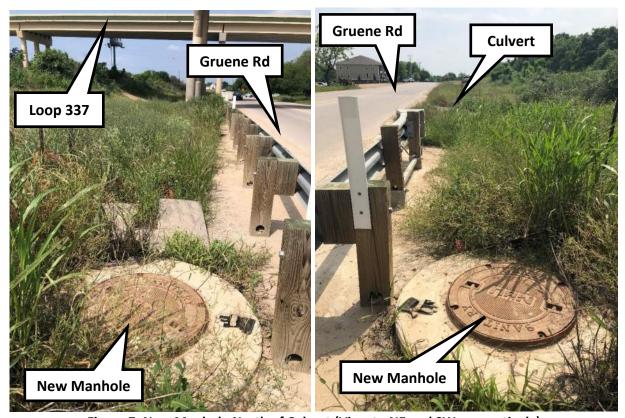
New Manhole North of Culvert (View to NE and SW, respectively)
